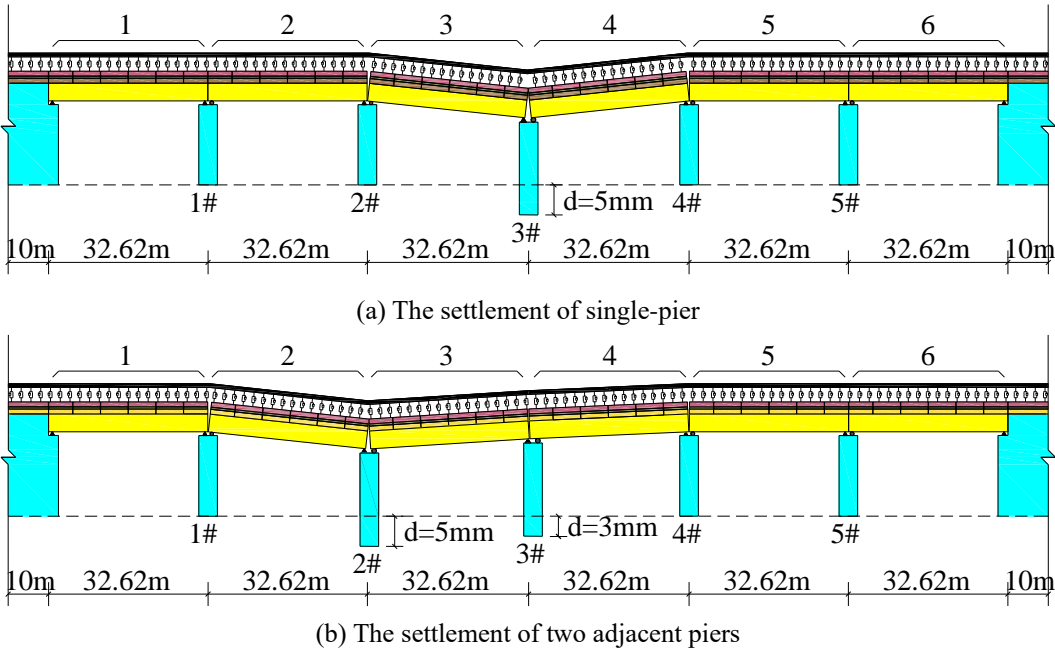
Deformation of six-span simply supported bridge during pier settlement
